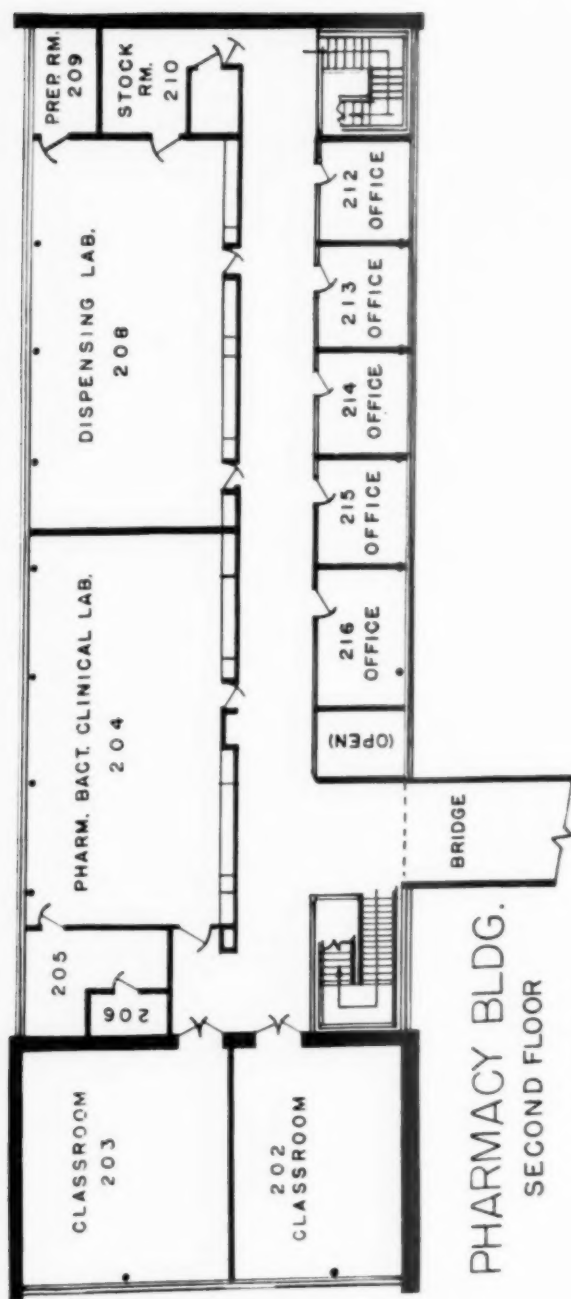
SECOND FLOOR PLAN, DRAKE UNIVERSITY
